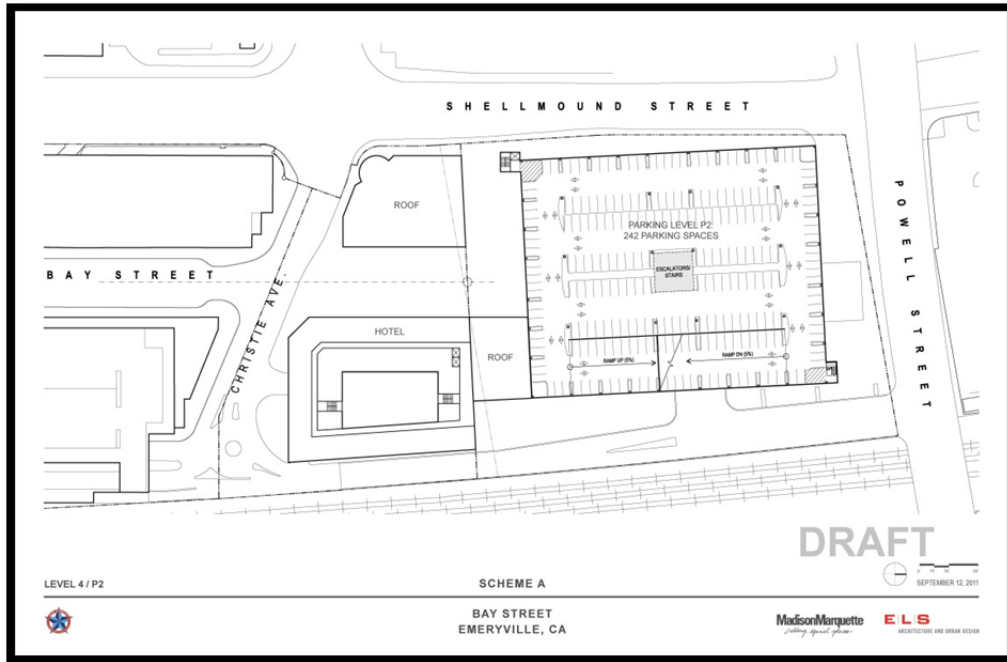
Madison Bay Street - Macy's Plan 2nd floor parking podium
